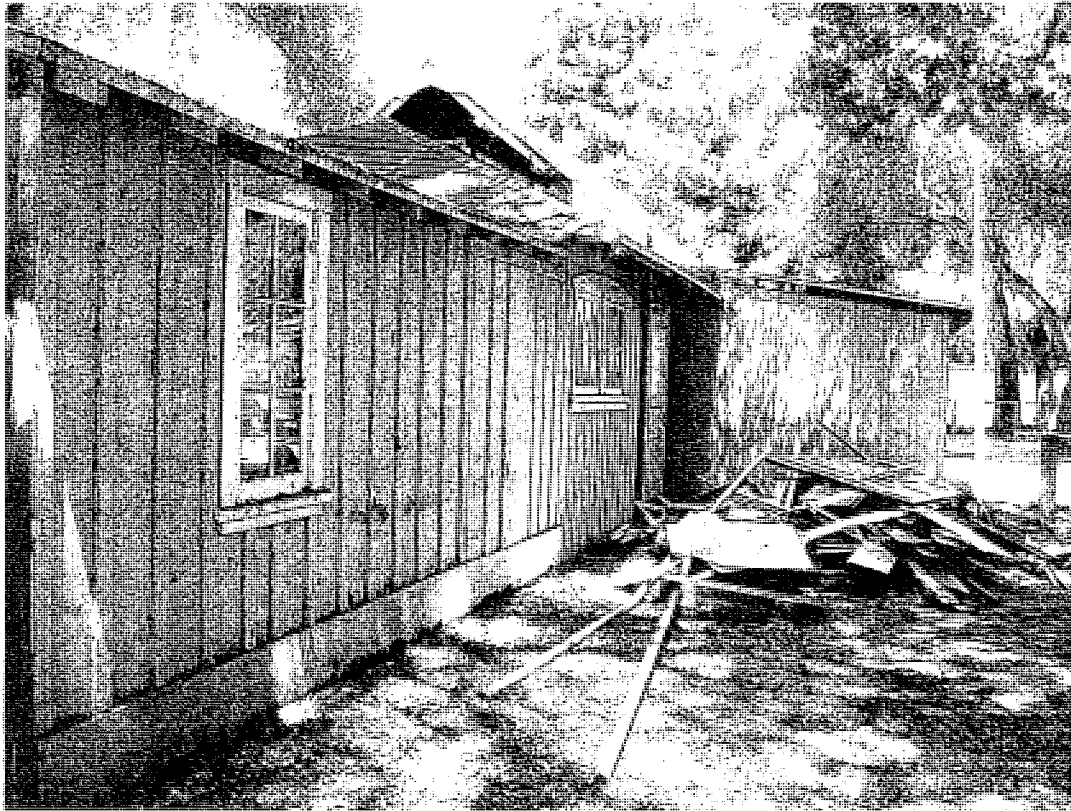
Looking east along the south side-elevation, August, 2005. (Note debris from auto damage).
